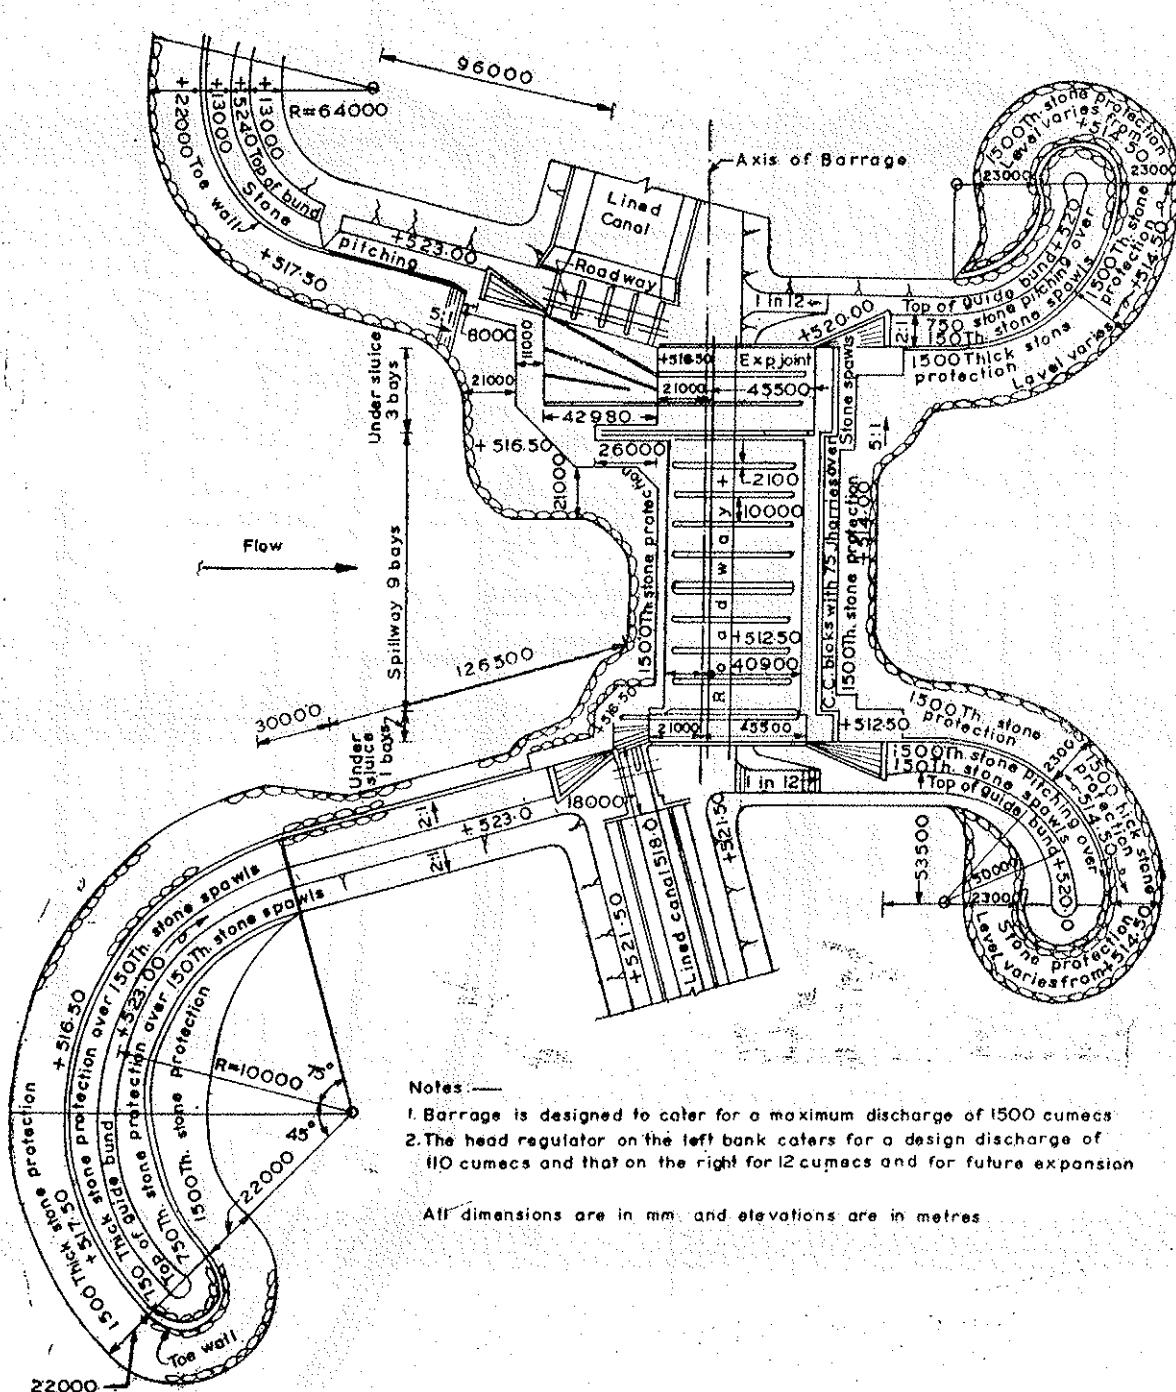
Detailed Layout Plan of Khanabed Barrage.
